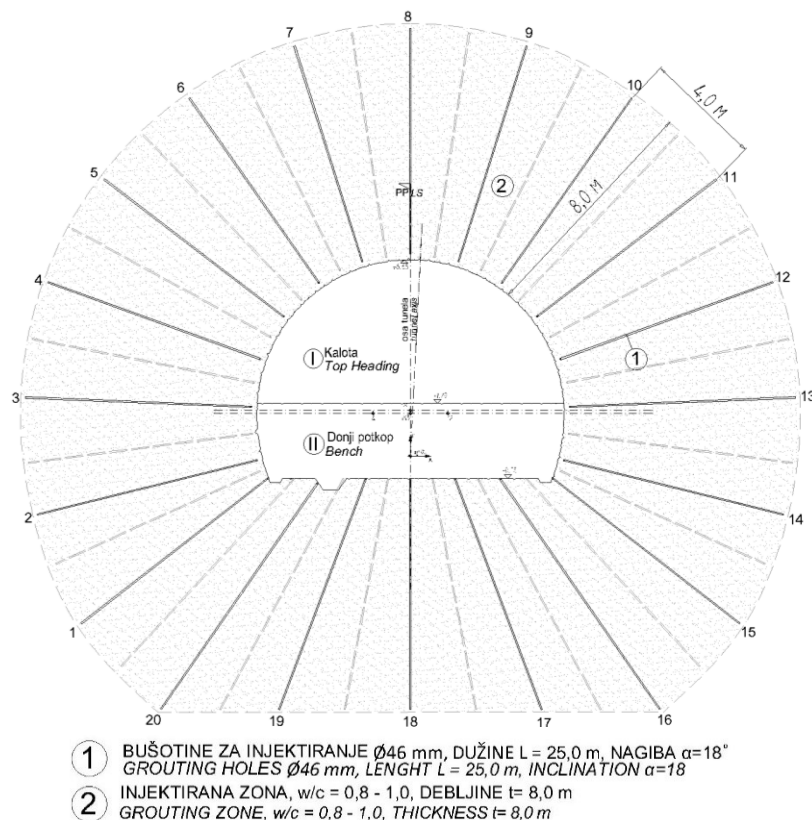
Cross-section of the tunnel with the pre-grouting procedure
